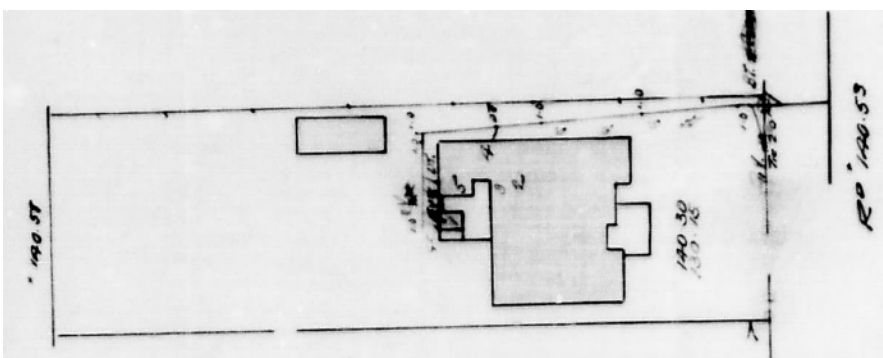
Drainage plan of the subject site dated March 1926, showing a footprint of the house and outbuildings, annotated with sewerage works (Source: SEW, Drainage Plan No. 152079)
